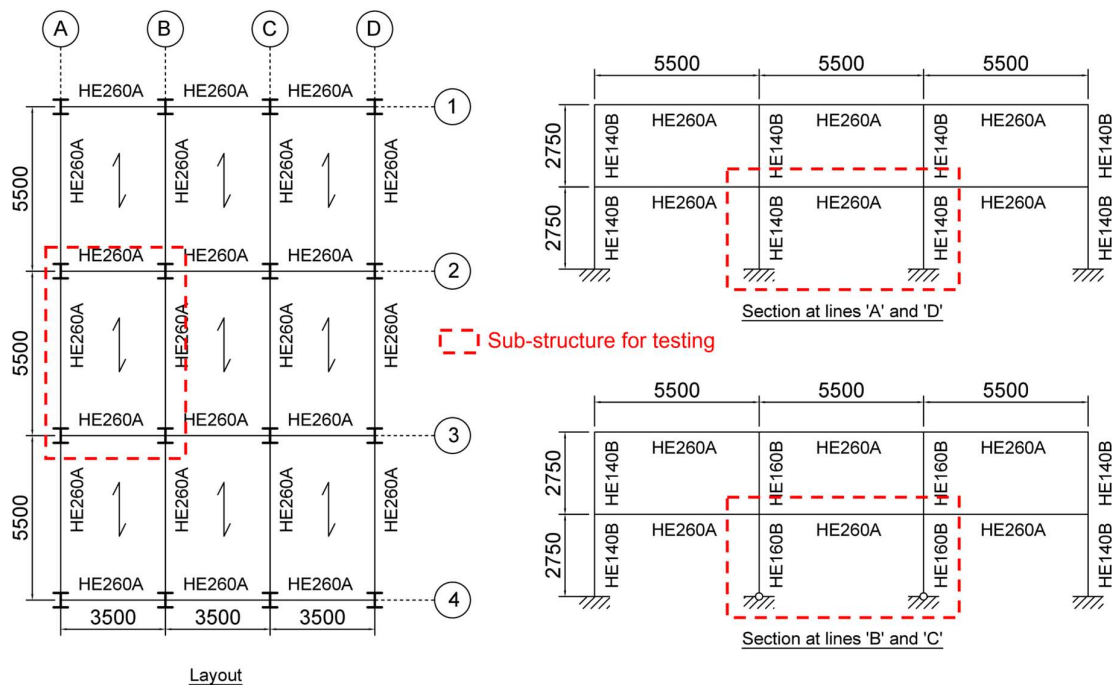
Layout and section views of the case study steel frame (unit: mm).
